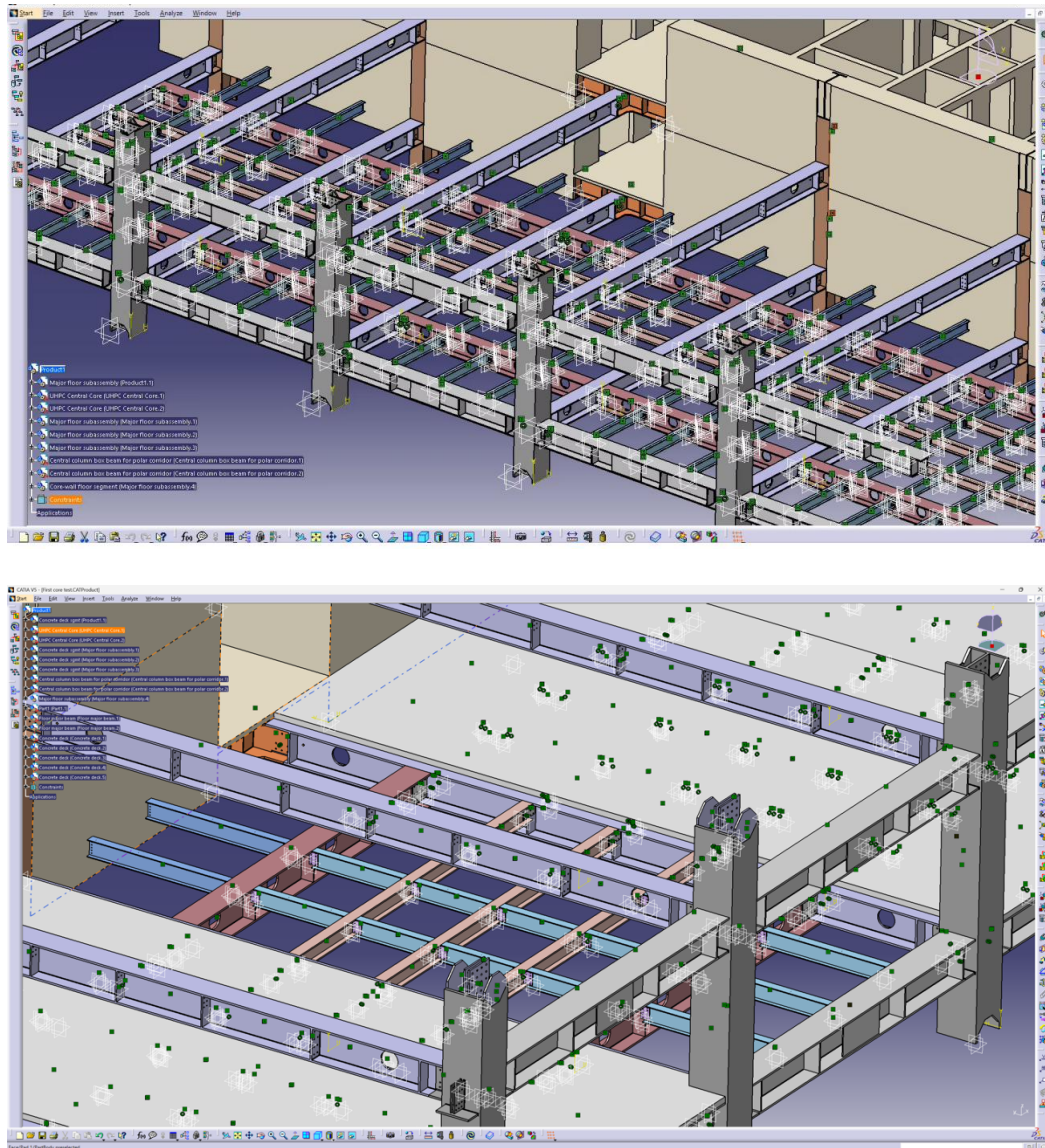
CATIA V5 assembly model screenshots of the tower structure, showing the UHPC central core segments, major floor subassemblies, longitudinal and lateral floor beams, and concrete-filled vertical box columns with assembly constraints applied.
